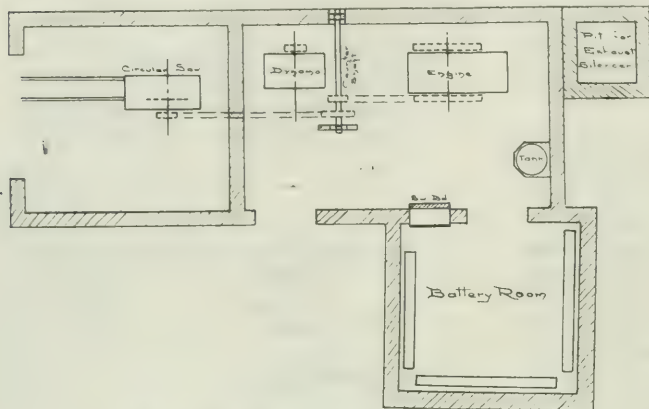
PLAN OF ELECTRICAL INSTALLATION AND SAW-MILL.
